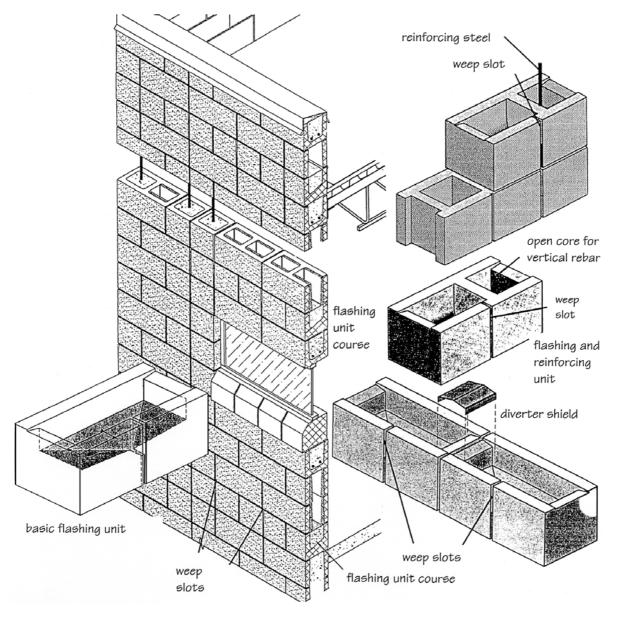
Patented block design with self-flashing and weeping capability for single-wythe concrete masonry walls.
